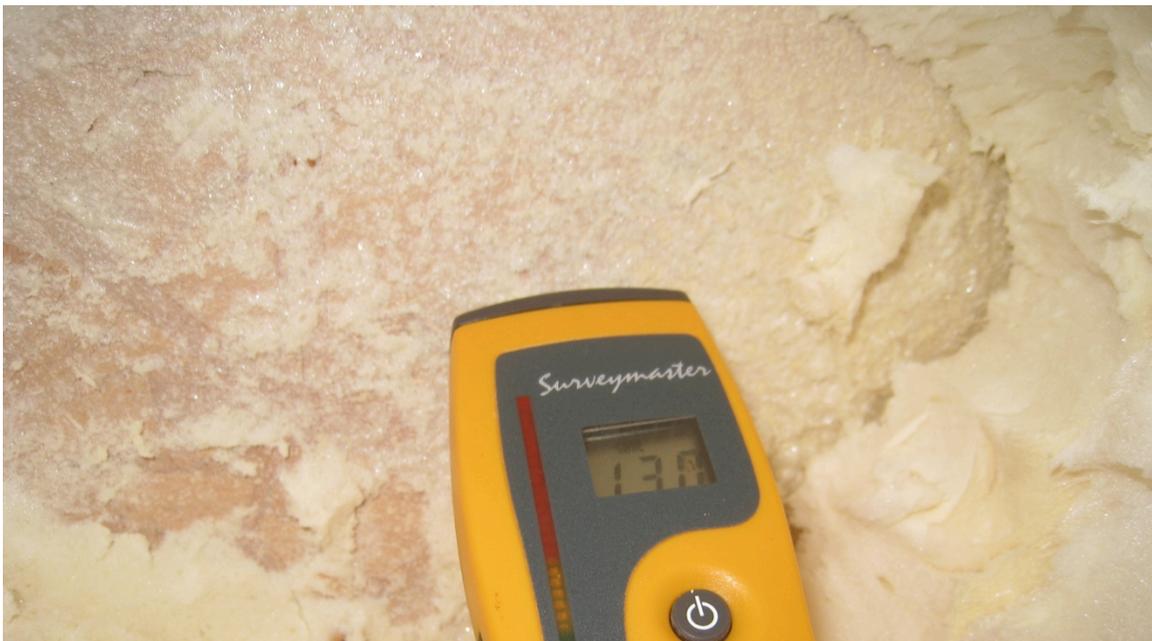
Coquitlam Hut 9 yr Photo – Roof 2, ocSPF-Insulated UCA with Latex Paint – Moisture Content on North-facing Slope
